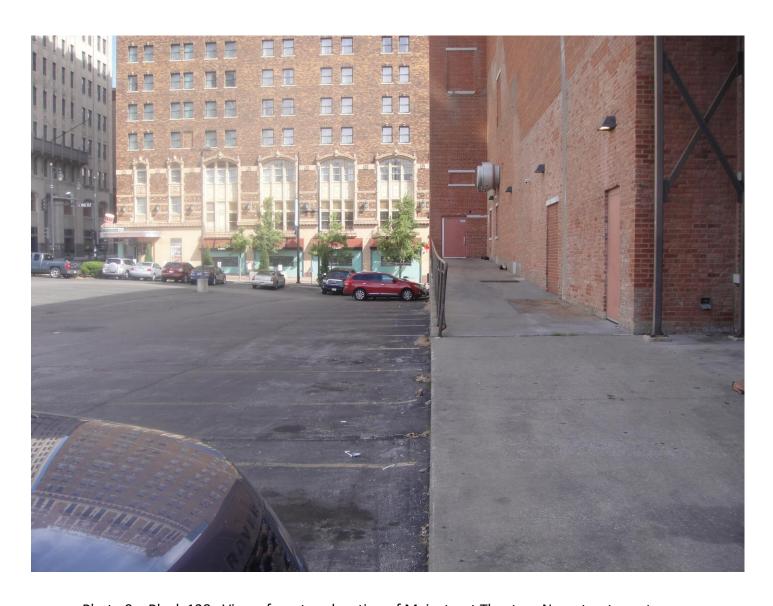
Block 138. View of western location of Mainstreet Theater. New structure at this location would abut this structure.
